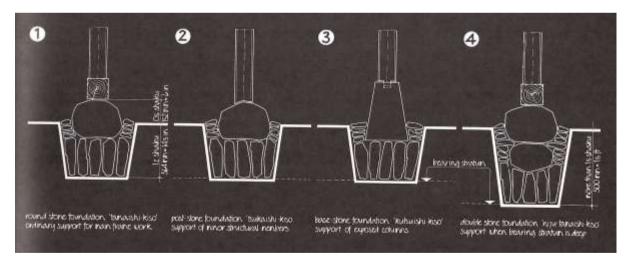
Footing Design [Measure and Construction of the Japanese House, Heino Engel]
